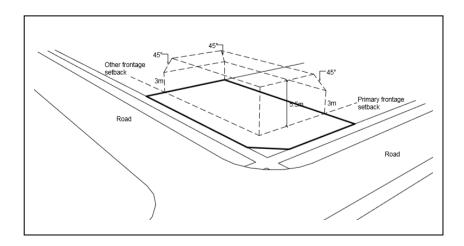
Building envelope for corner lots as required by clause CCO-S5.7.1 A1 and A2 that is in substitution for General Residential Zone – clause 8.4.2 A3 and clause 8.5.1 A2)
